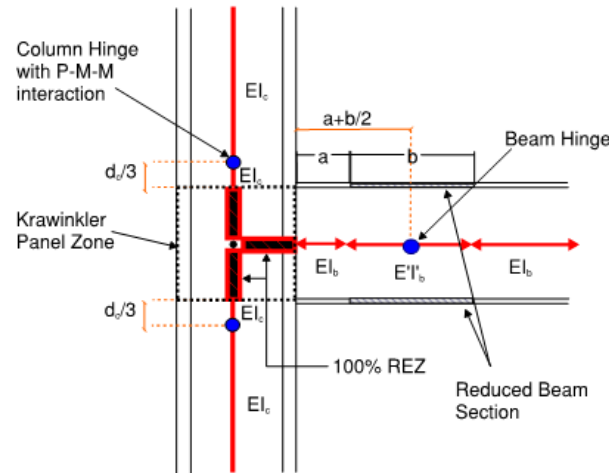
Perform 3D Model of Beam-Column Joint with RBS Moment Connections
